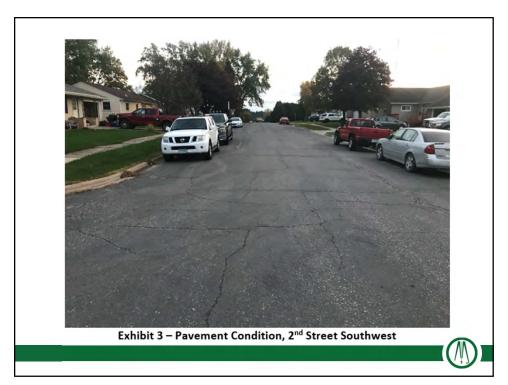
Pavement Condition, 2nd Street Southwest
